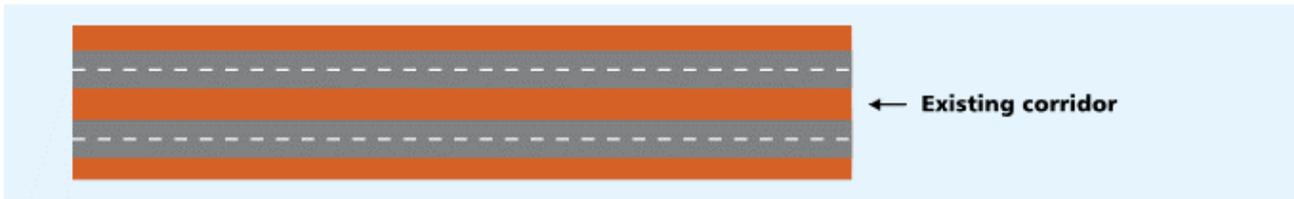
'New road' example – substantially realigned duplication or upgraded road.
